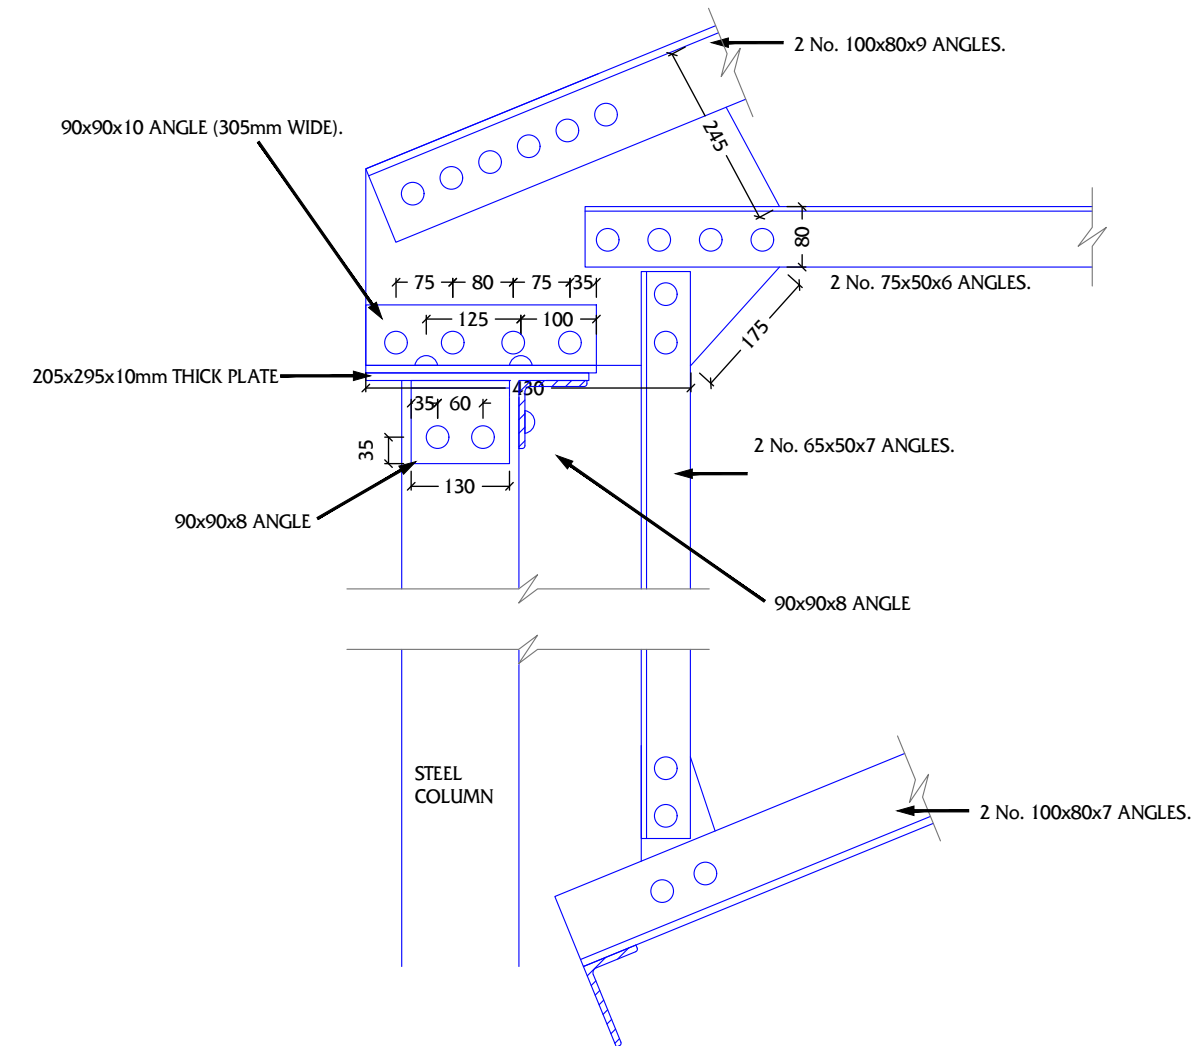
PART ELEVATION LOOKING SOUTH SHOWING DETAILS OF PARTIALLY EXPOSED ROOF TRUSS END CONNECTION - SURVEY AREA G10 SCALE 1:10
